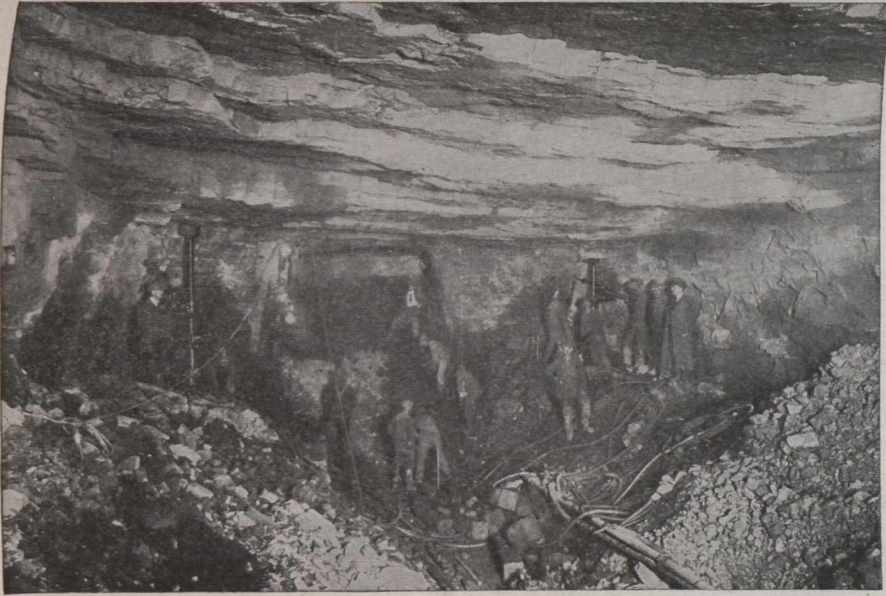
Widening the tunnel in a "break-up," entry in centre, column drills at sides
